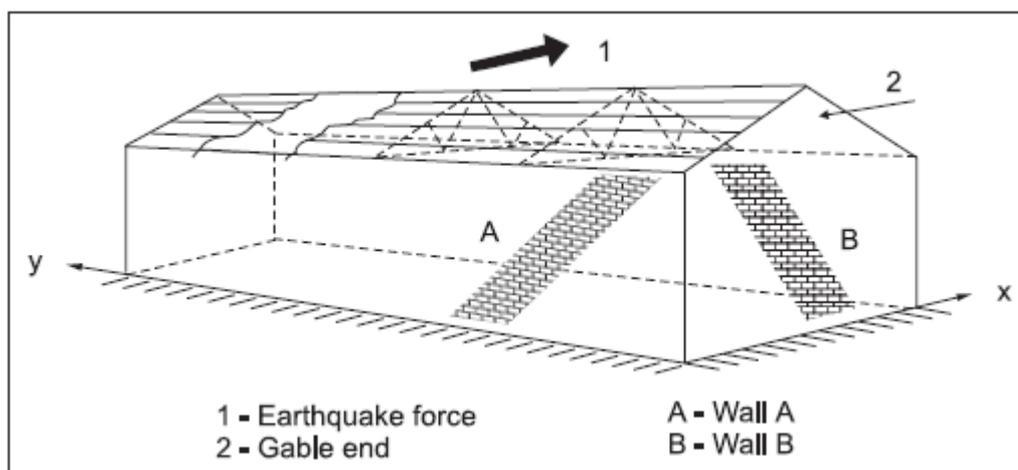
22 Long building with roof truss structures (IAEE, 2004)
